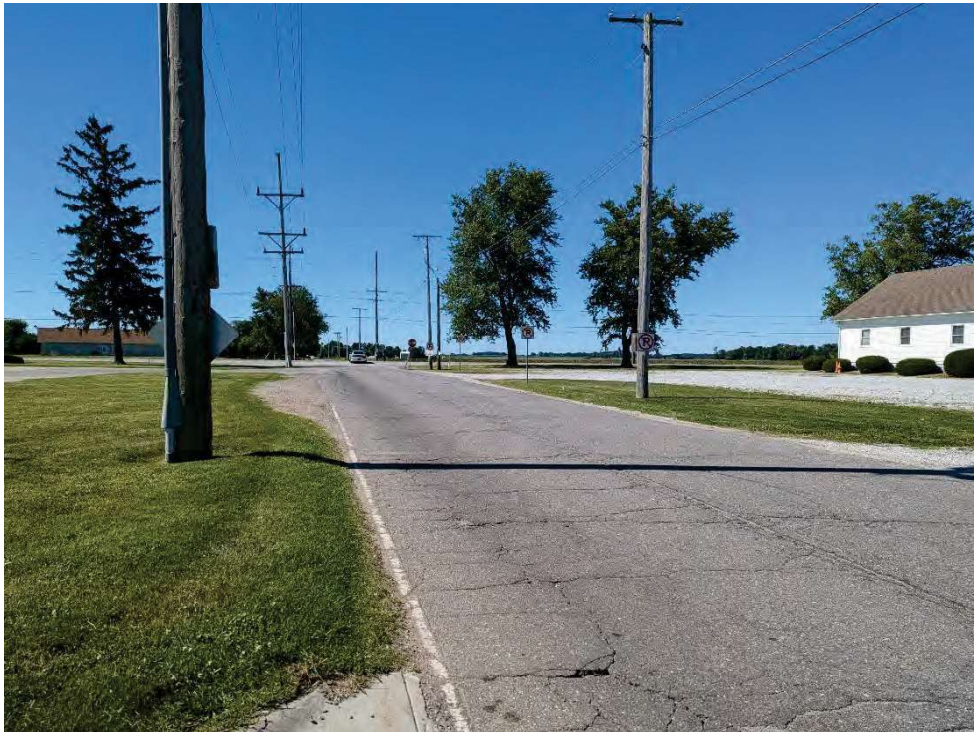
Streetscape view facing south showing S CR 500 W from the north end of the project area
